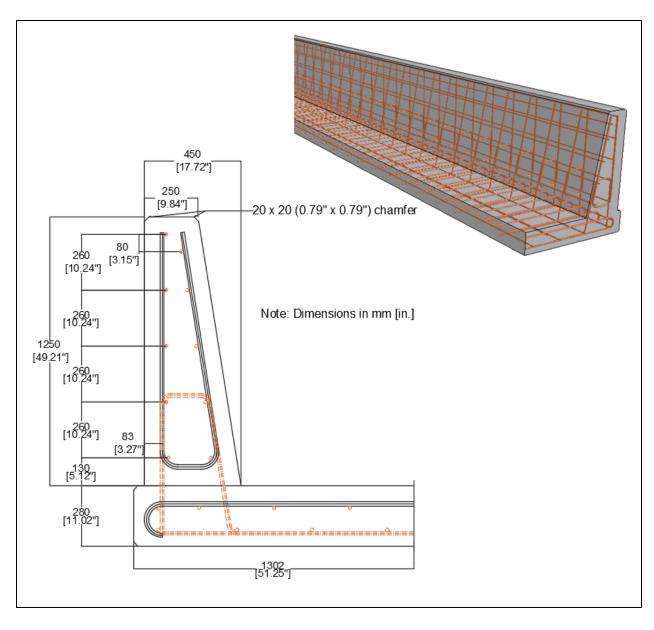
Cross-section and layout of Manitoba Concrete Bridge Rail FE model
